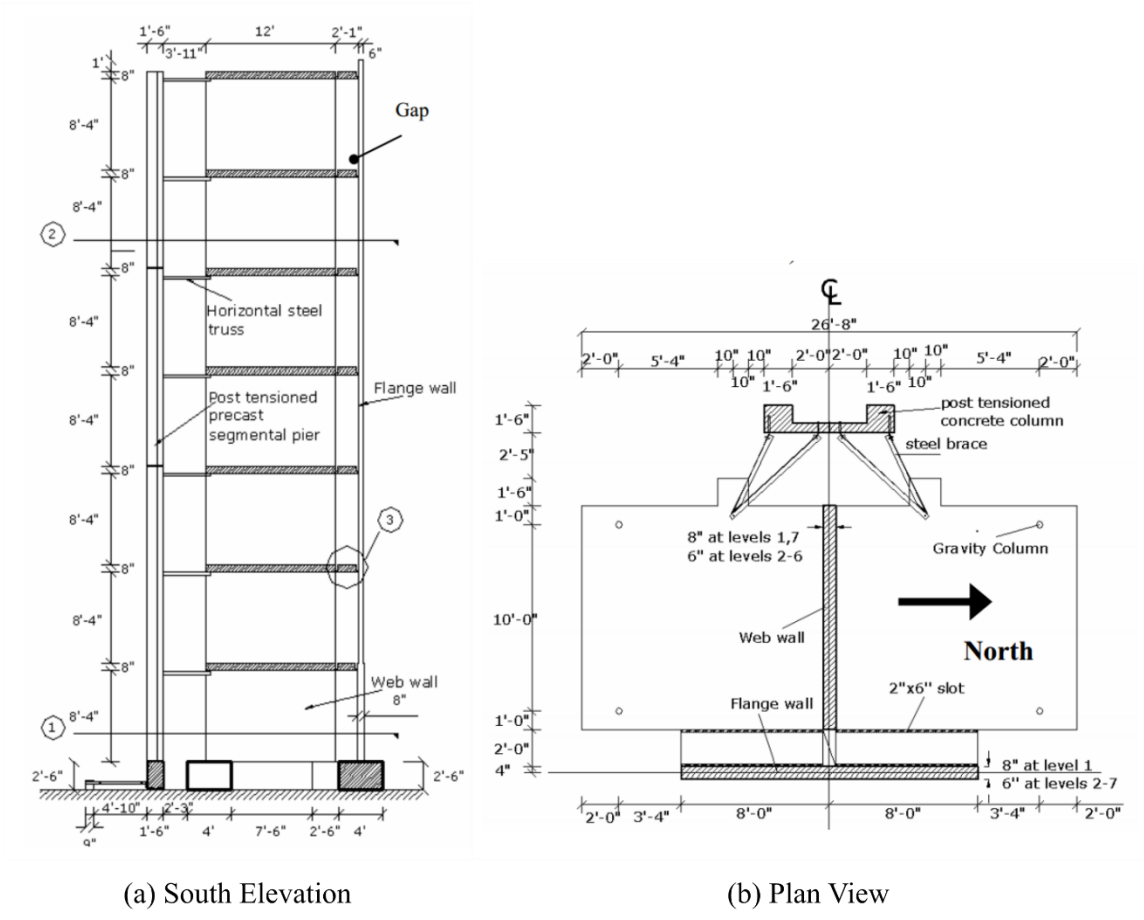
Elevation and plan view of building slice tested by Panagiotou et al. [from Panagiotou et al. (2007), Fig. 2.1].
